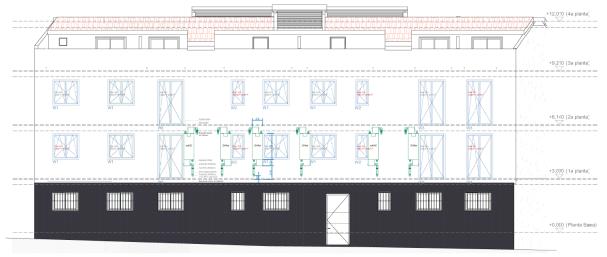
VENTILATION UNIT IN THE EAST ELEVATION
